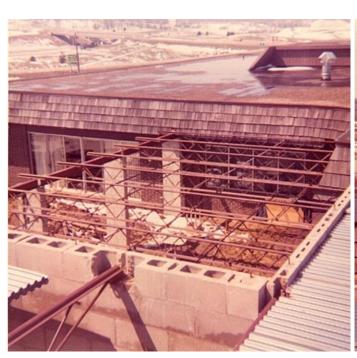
Construction photos, lower level of south motel wing decked, looking northeast, both December 1972 (Courtesy of Sheila Boyd)
